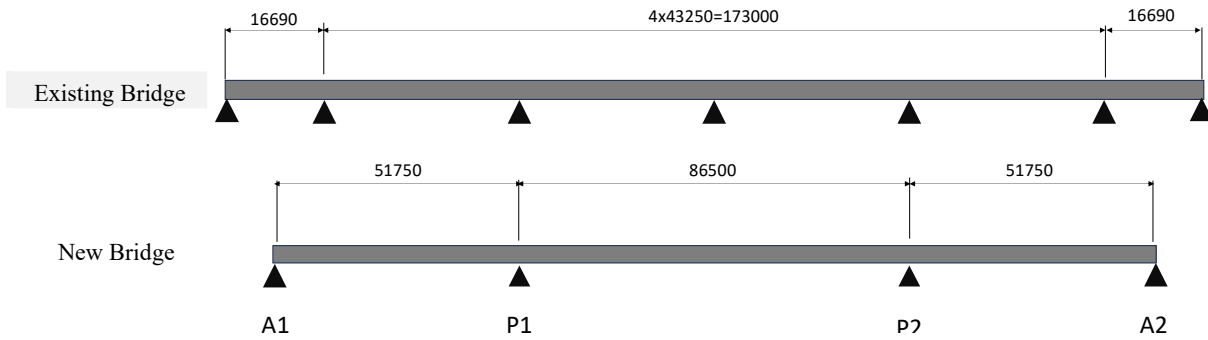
Span Arrangement for New Naryn Bridge
